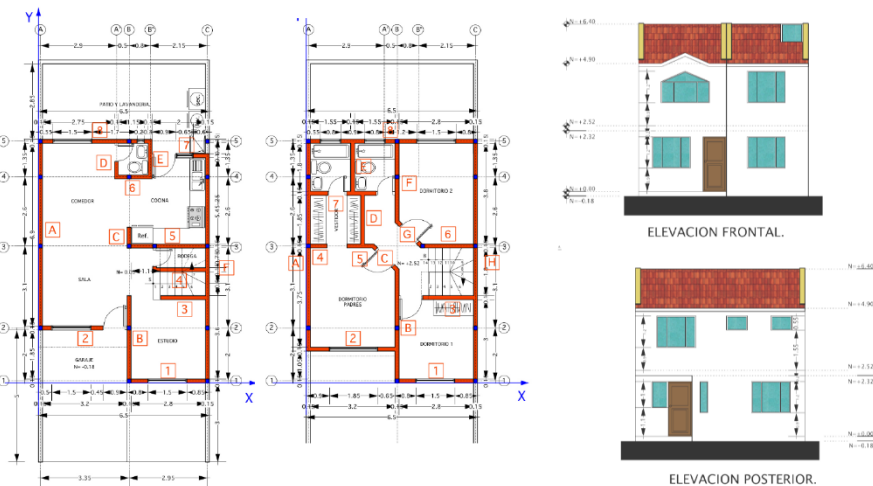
Architectural drawings of the prototype dwelling Laguna del Sol: plans and elevation views.
